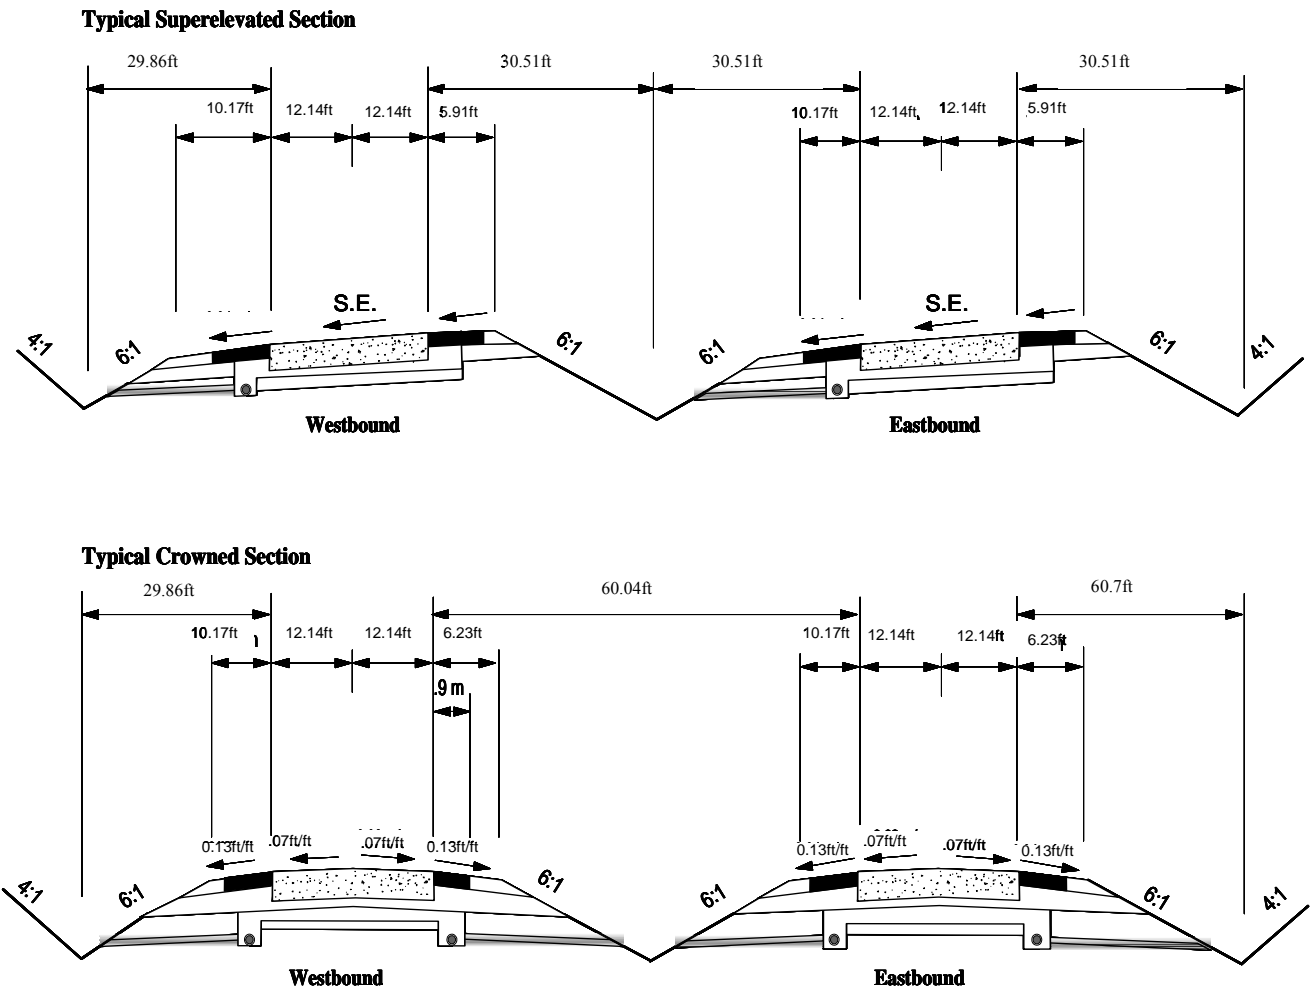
Typical cross sections for crowned and superelevated pavement sections (ERES, 1999).
